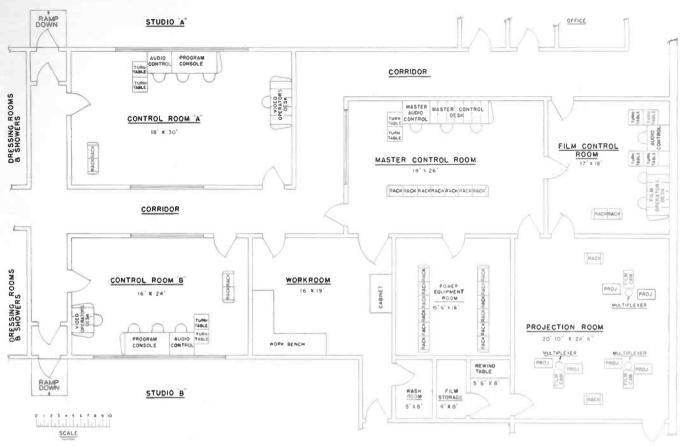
Diagram showing Layout of Control Rooms and Arrangement of Equipment for the Type F Station.
